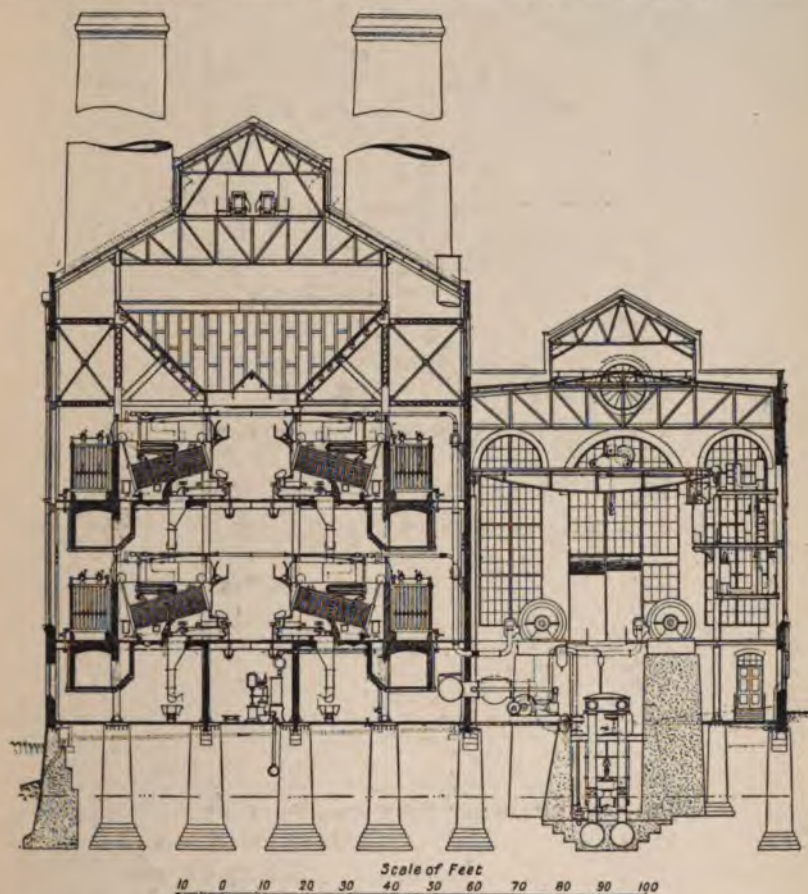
CROSS-SECTION OF CHELSEA POWER STATION OF THE LONDON UNDERGROUND RAILWAYS CO.
